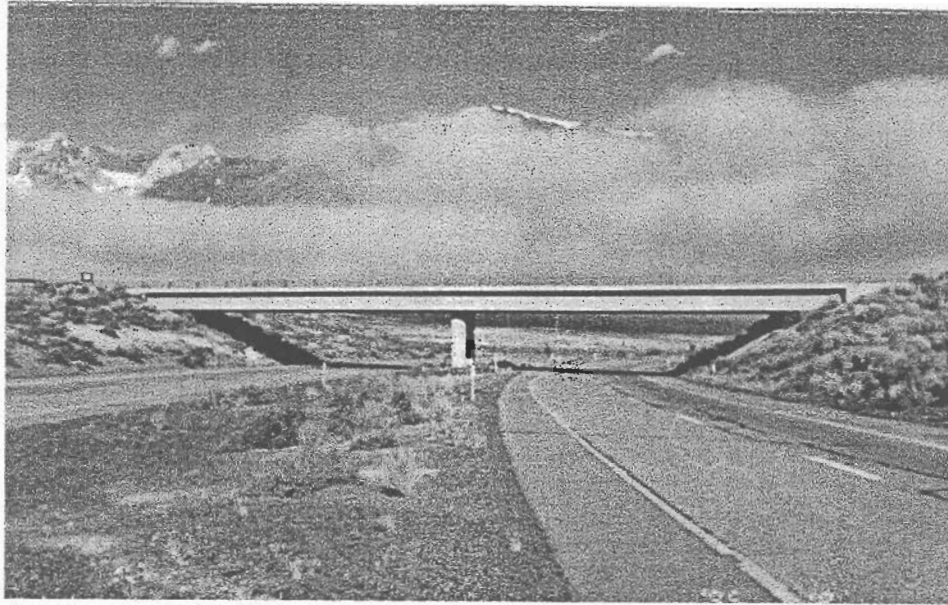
Picture of the Highway 395 Bridge near Lake Crowley. The bridge is a two-span, 203 feet long concrete box girder structure with a two-column bent.
